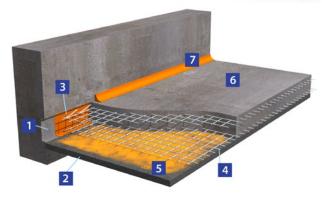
Waterproofing the slab bottom and slurry wall keyway: 1 - keyway; 2 - lean concrete under slab; 3 - keyway seal; 4 - reinforcement; 5 - Hydrostop-Mix sifted evenly; 6 - slab concrete; 7 - wedge-shaped seal at wall.
